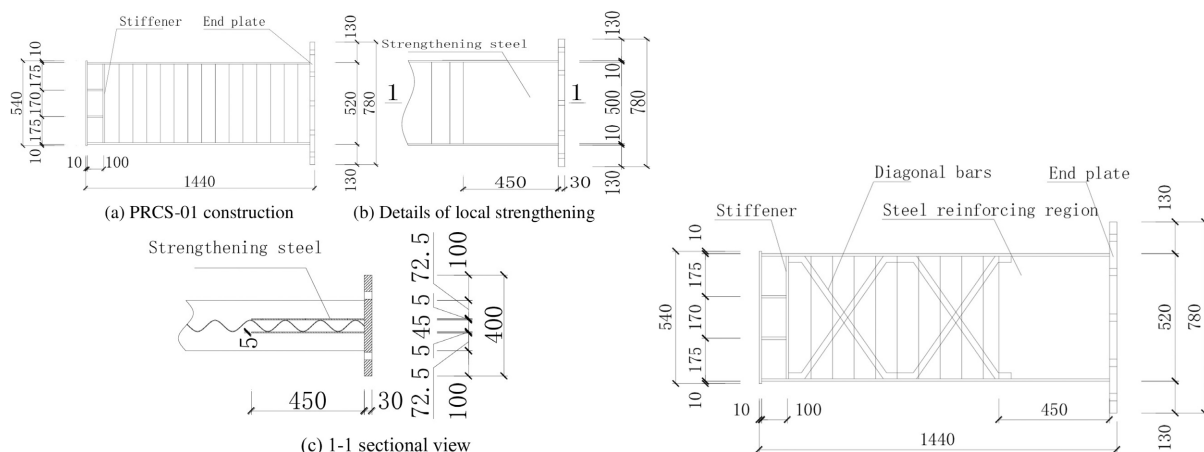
Steel frame sizes of specimen PRCS-01 and construction of the steel beam in specimen PPRCS-02
